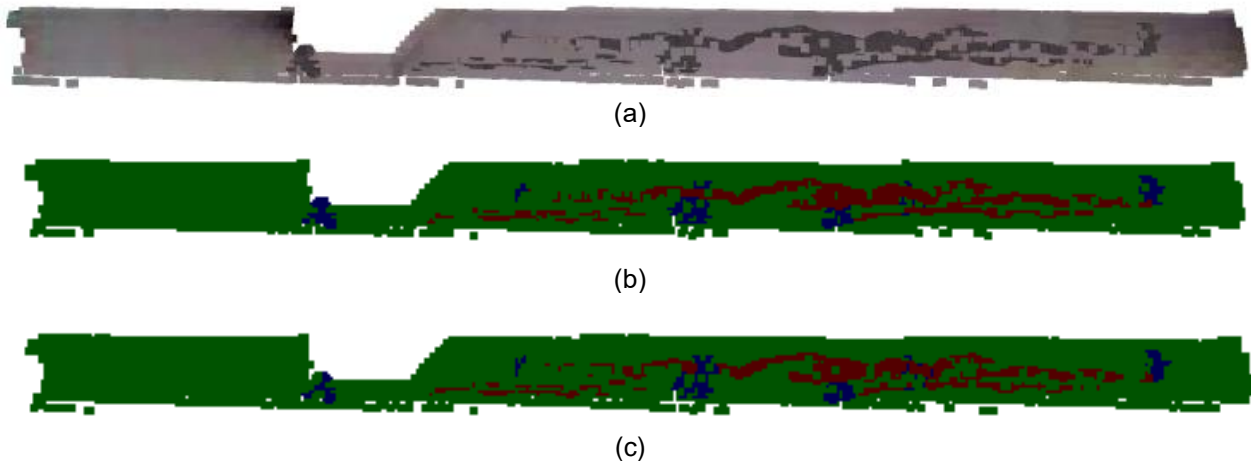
(a) primitive point cloud, (b) ground truth (red: crack, green: spalling and blue: bridge pier), (c) segmentation result
